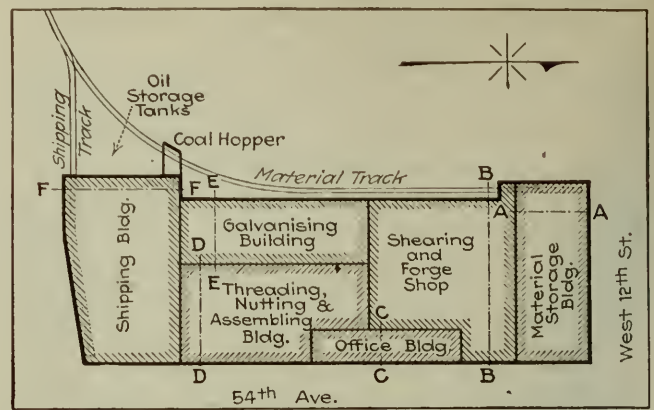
SECTIONS OF FACTORY BUILDINGS
